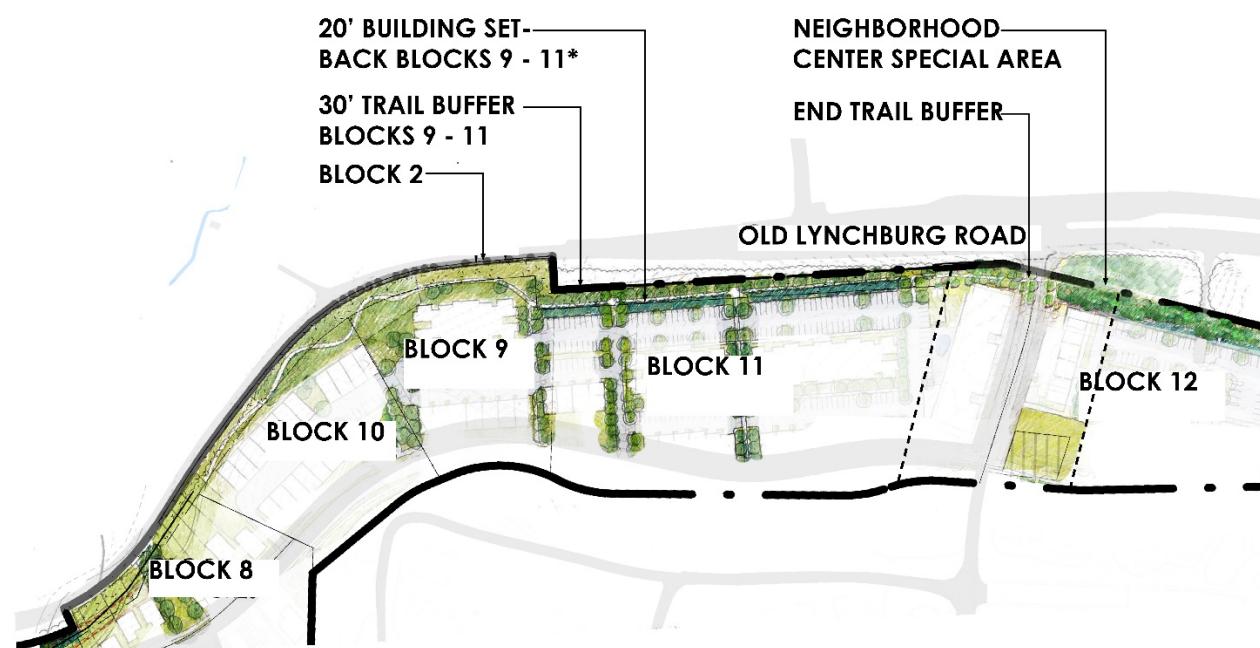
Conceptual Landscape Plan: Trail Buffer / Block 2
